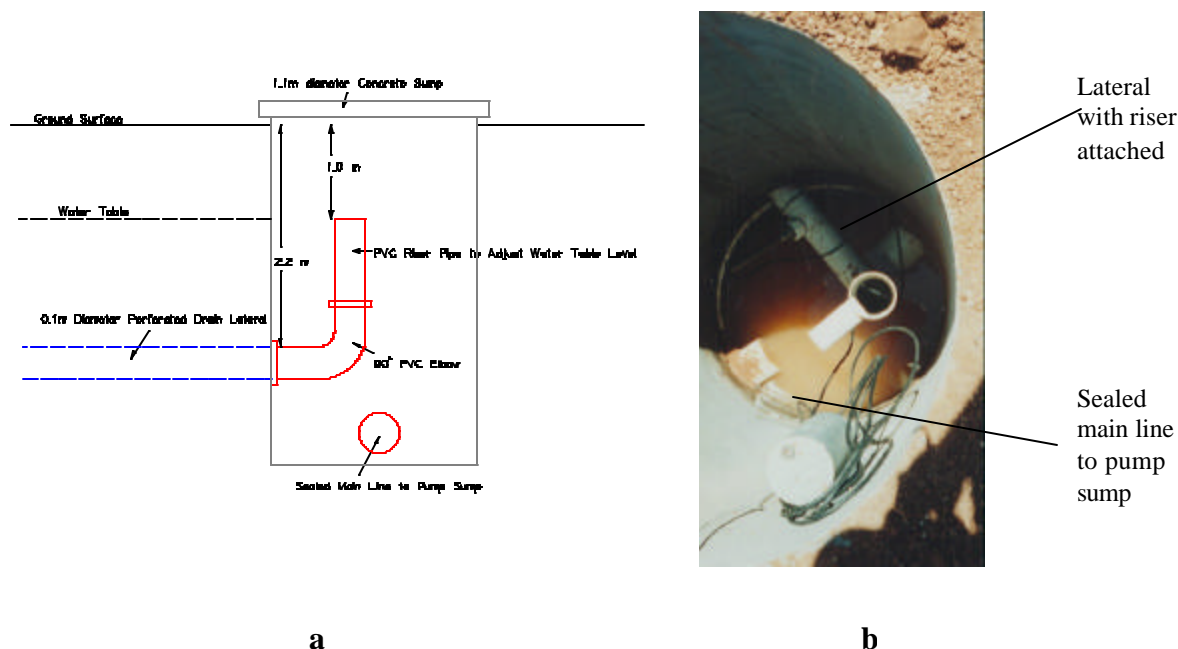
Schematic (a) and photograph (b) of PVC pipe riser used for controlling subsurface drainage flow at the CWM site
